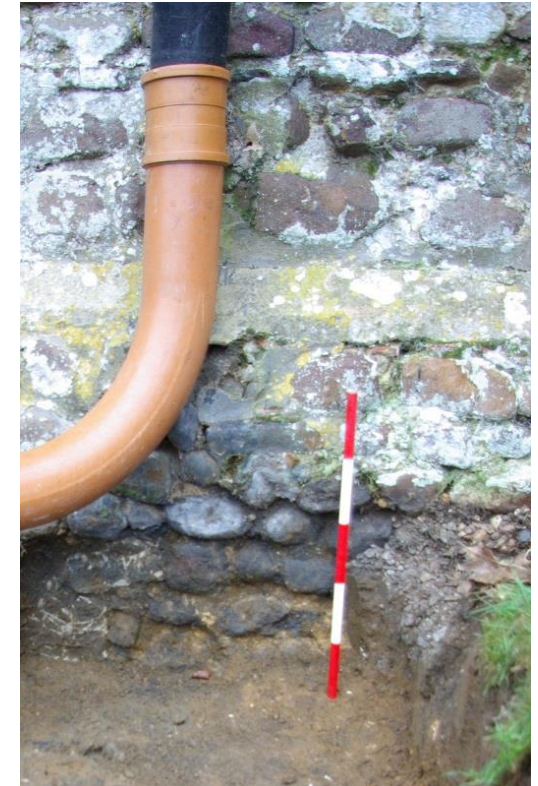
Gully trench [24], chancel wall footing, looking SSW, 0.5m scale
